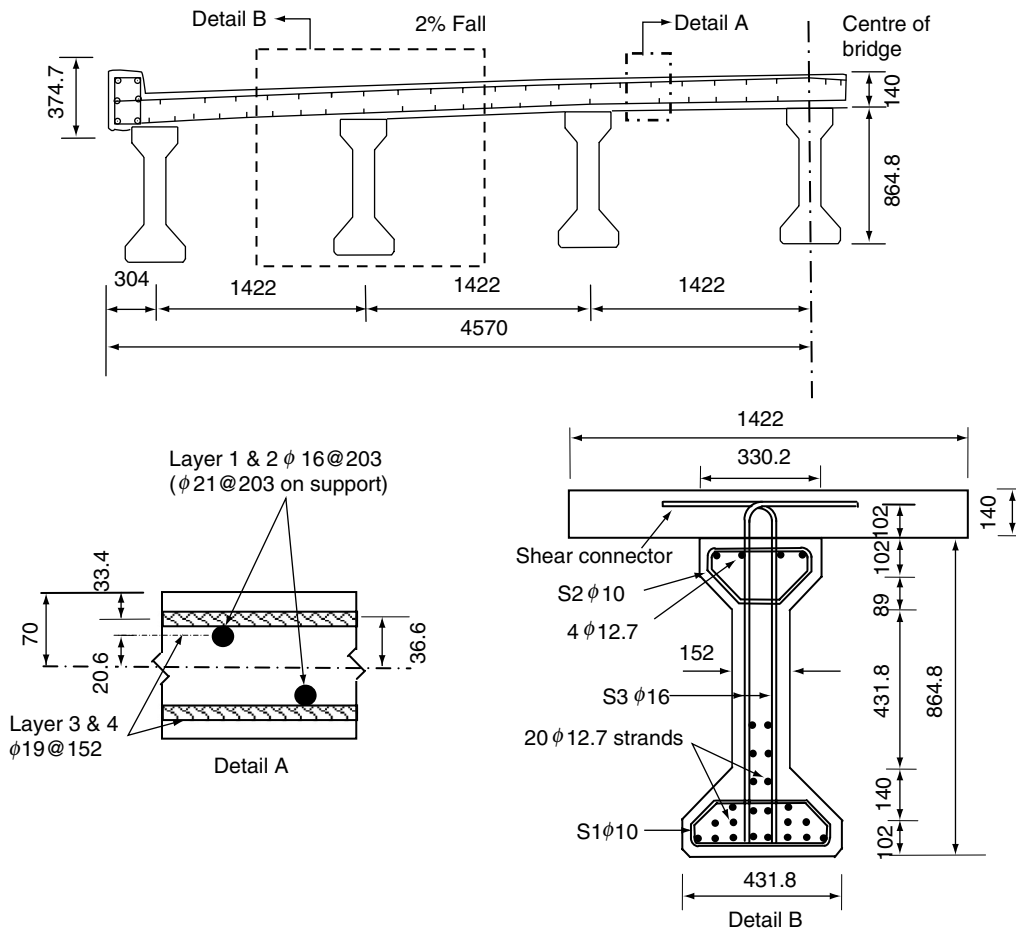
Dimension of the bridge deck and the reinforcement in the middle span (unit: mm)
